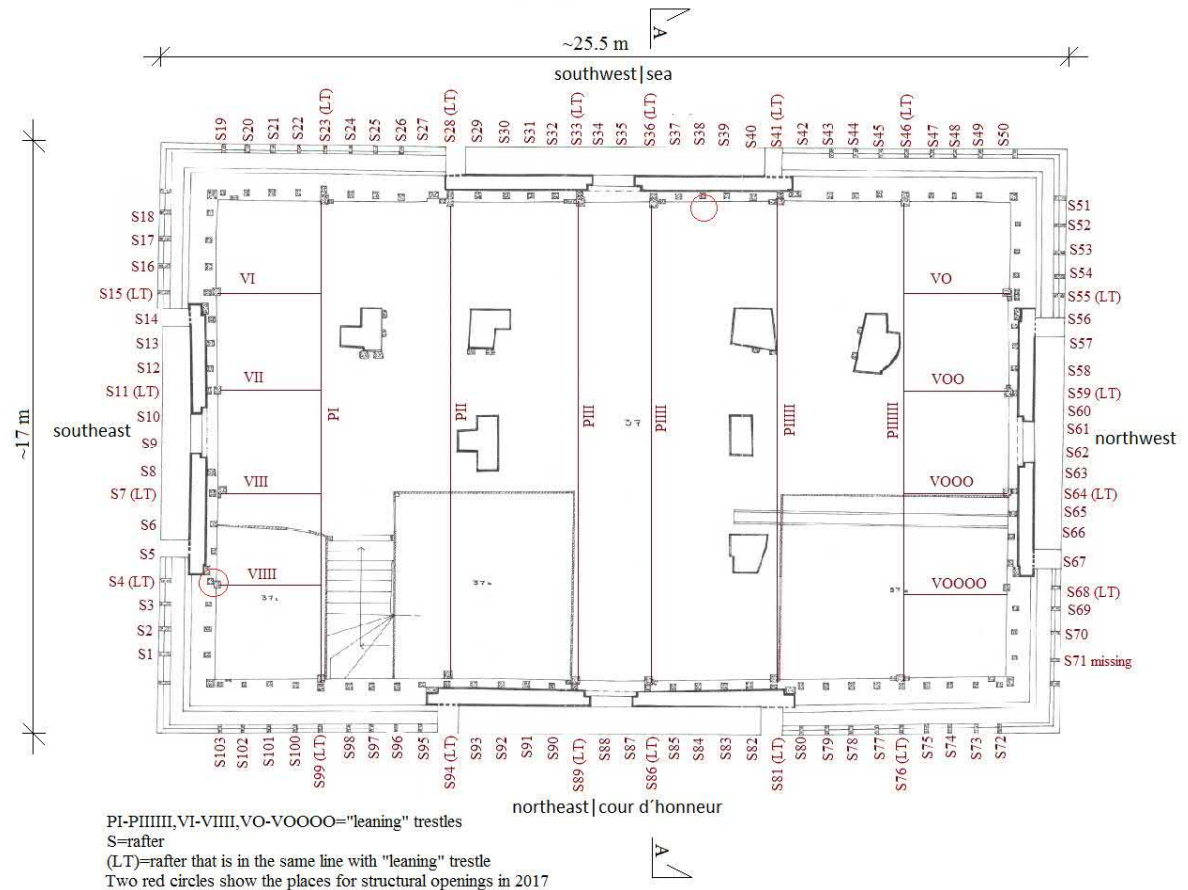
The markings that are used for the leaning trestles and rafters in the floor plan drawing of the attic.
